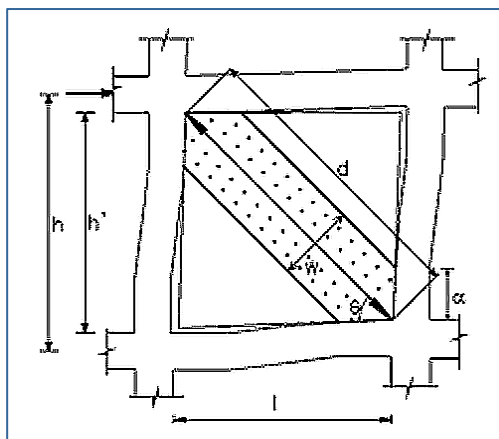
The “Equivalent Diagonal Strut” of a masonry infill wall in an RC frame (Erberik & Elnashai 2003).
